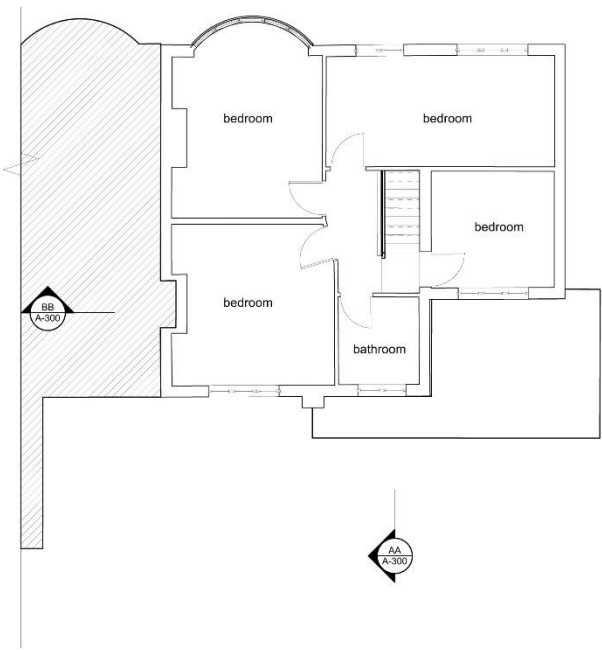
Existing & Proposed Ground & 1st Floor Plans
